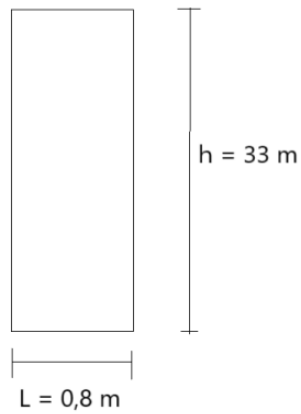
Cross section considered to calculate the drag force, leading edge.
